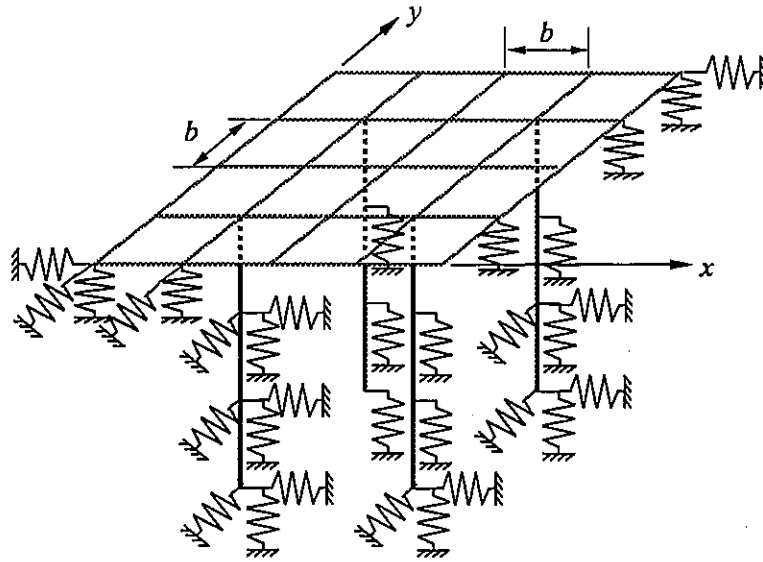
Plate-beam-spring modelling of a piled raft foundation.
